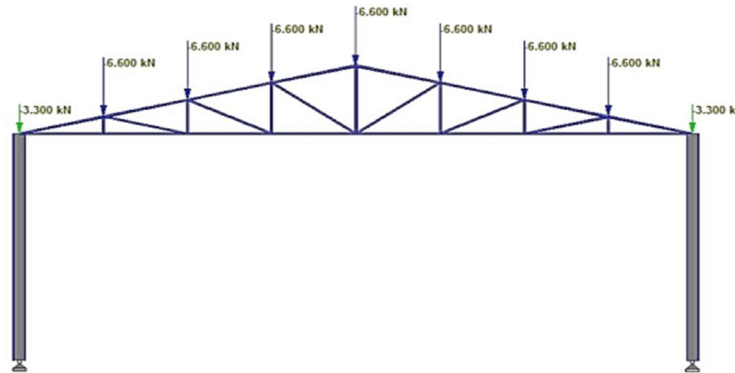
Dead loads acting at the purlin positions of conventional steel frame
